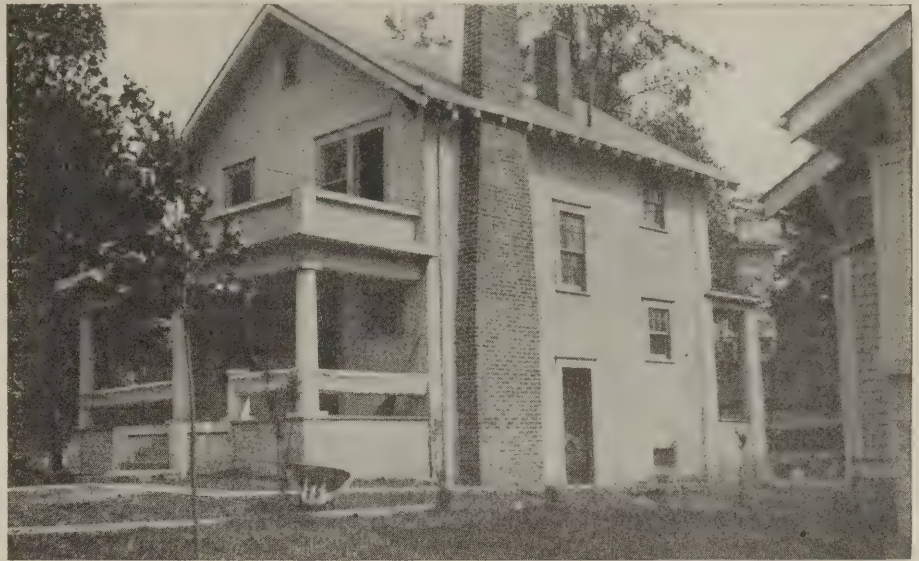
Front and side of finished house. Note gutter on roof and exposed rafter ends
